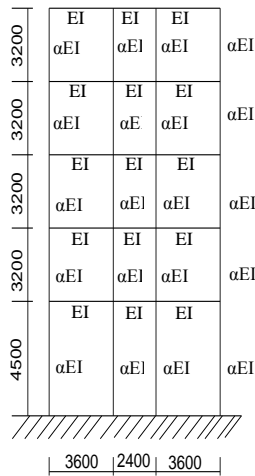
A Five-Floor, Multi-bay Simulated Reinforced Concrete Frame showing the Flexural Rigidity Arrangement for the Structural Members.
